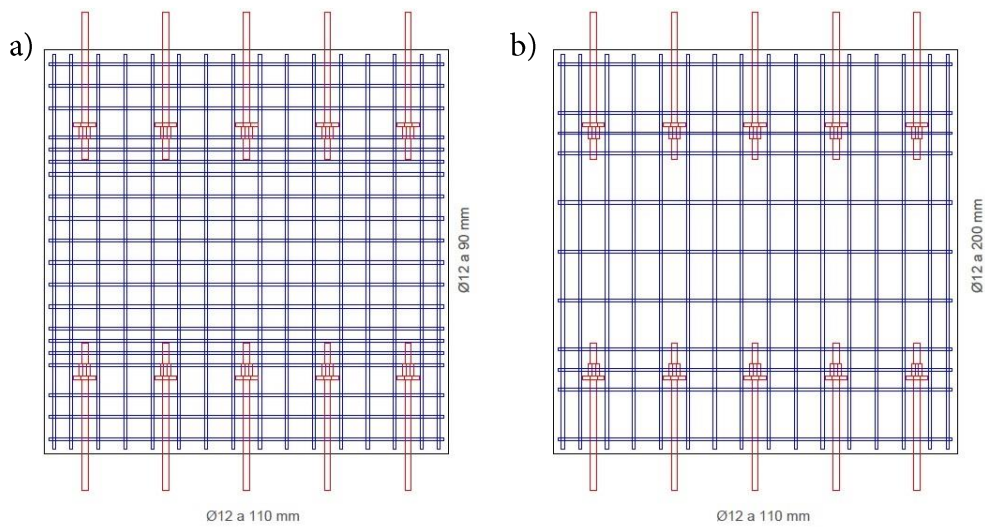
Reinforcement layout of "type A" slabs. a) Tension side. b) Compression side.
